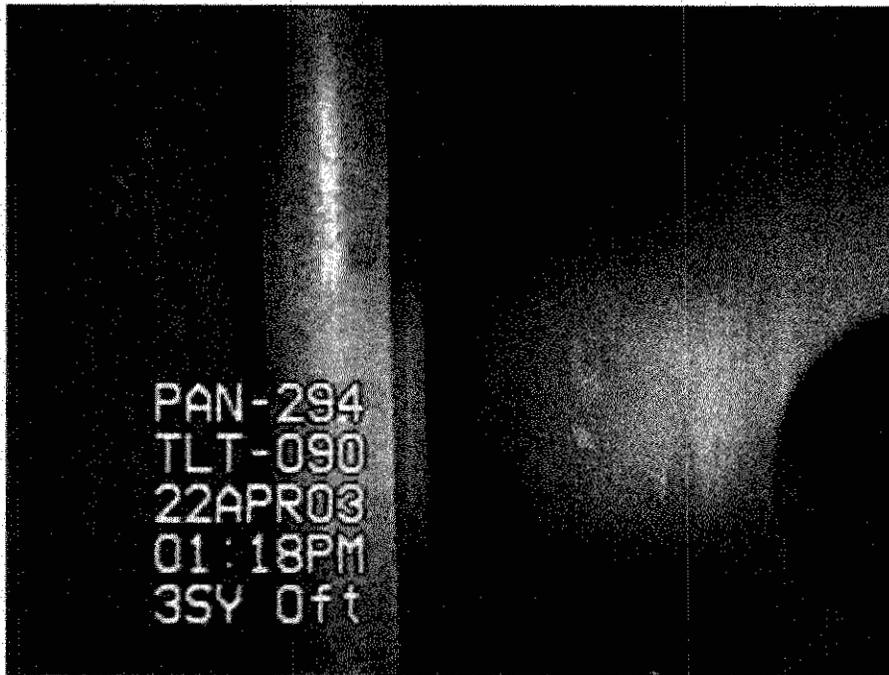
SY-103 Riser 46, Secondary Tank Wall (Right, 2003)
